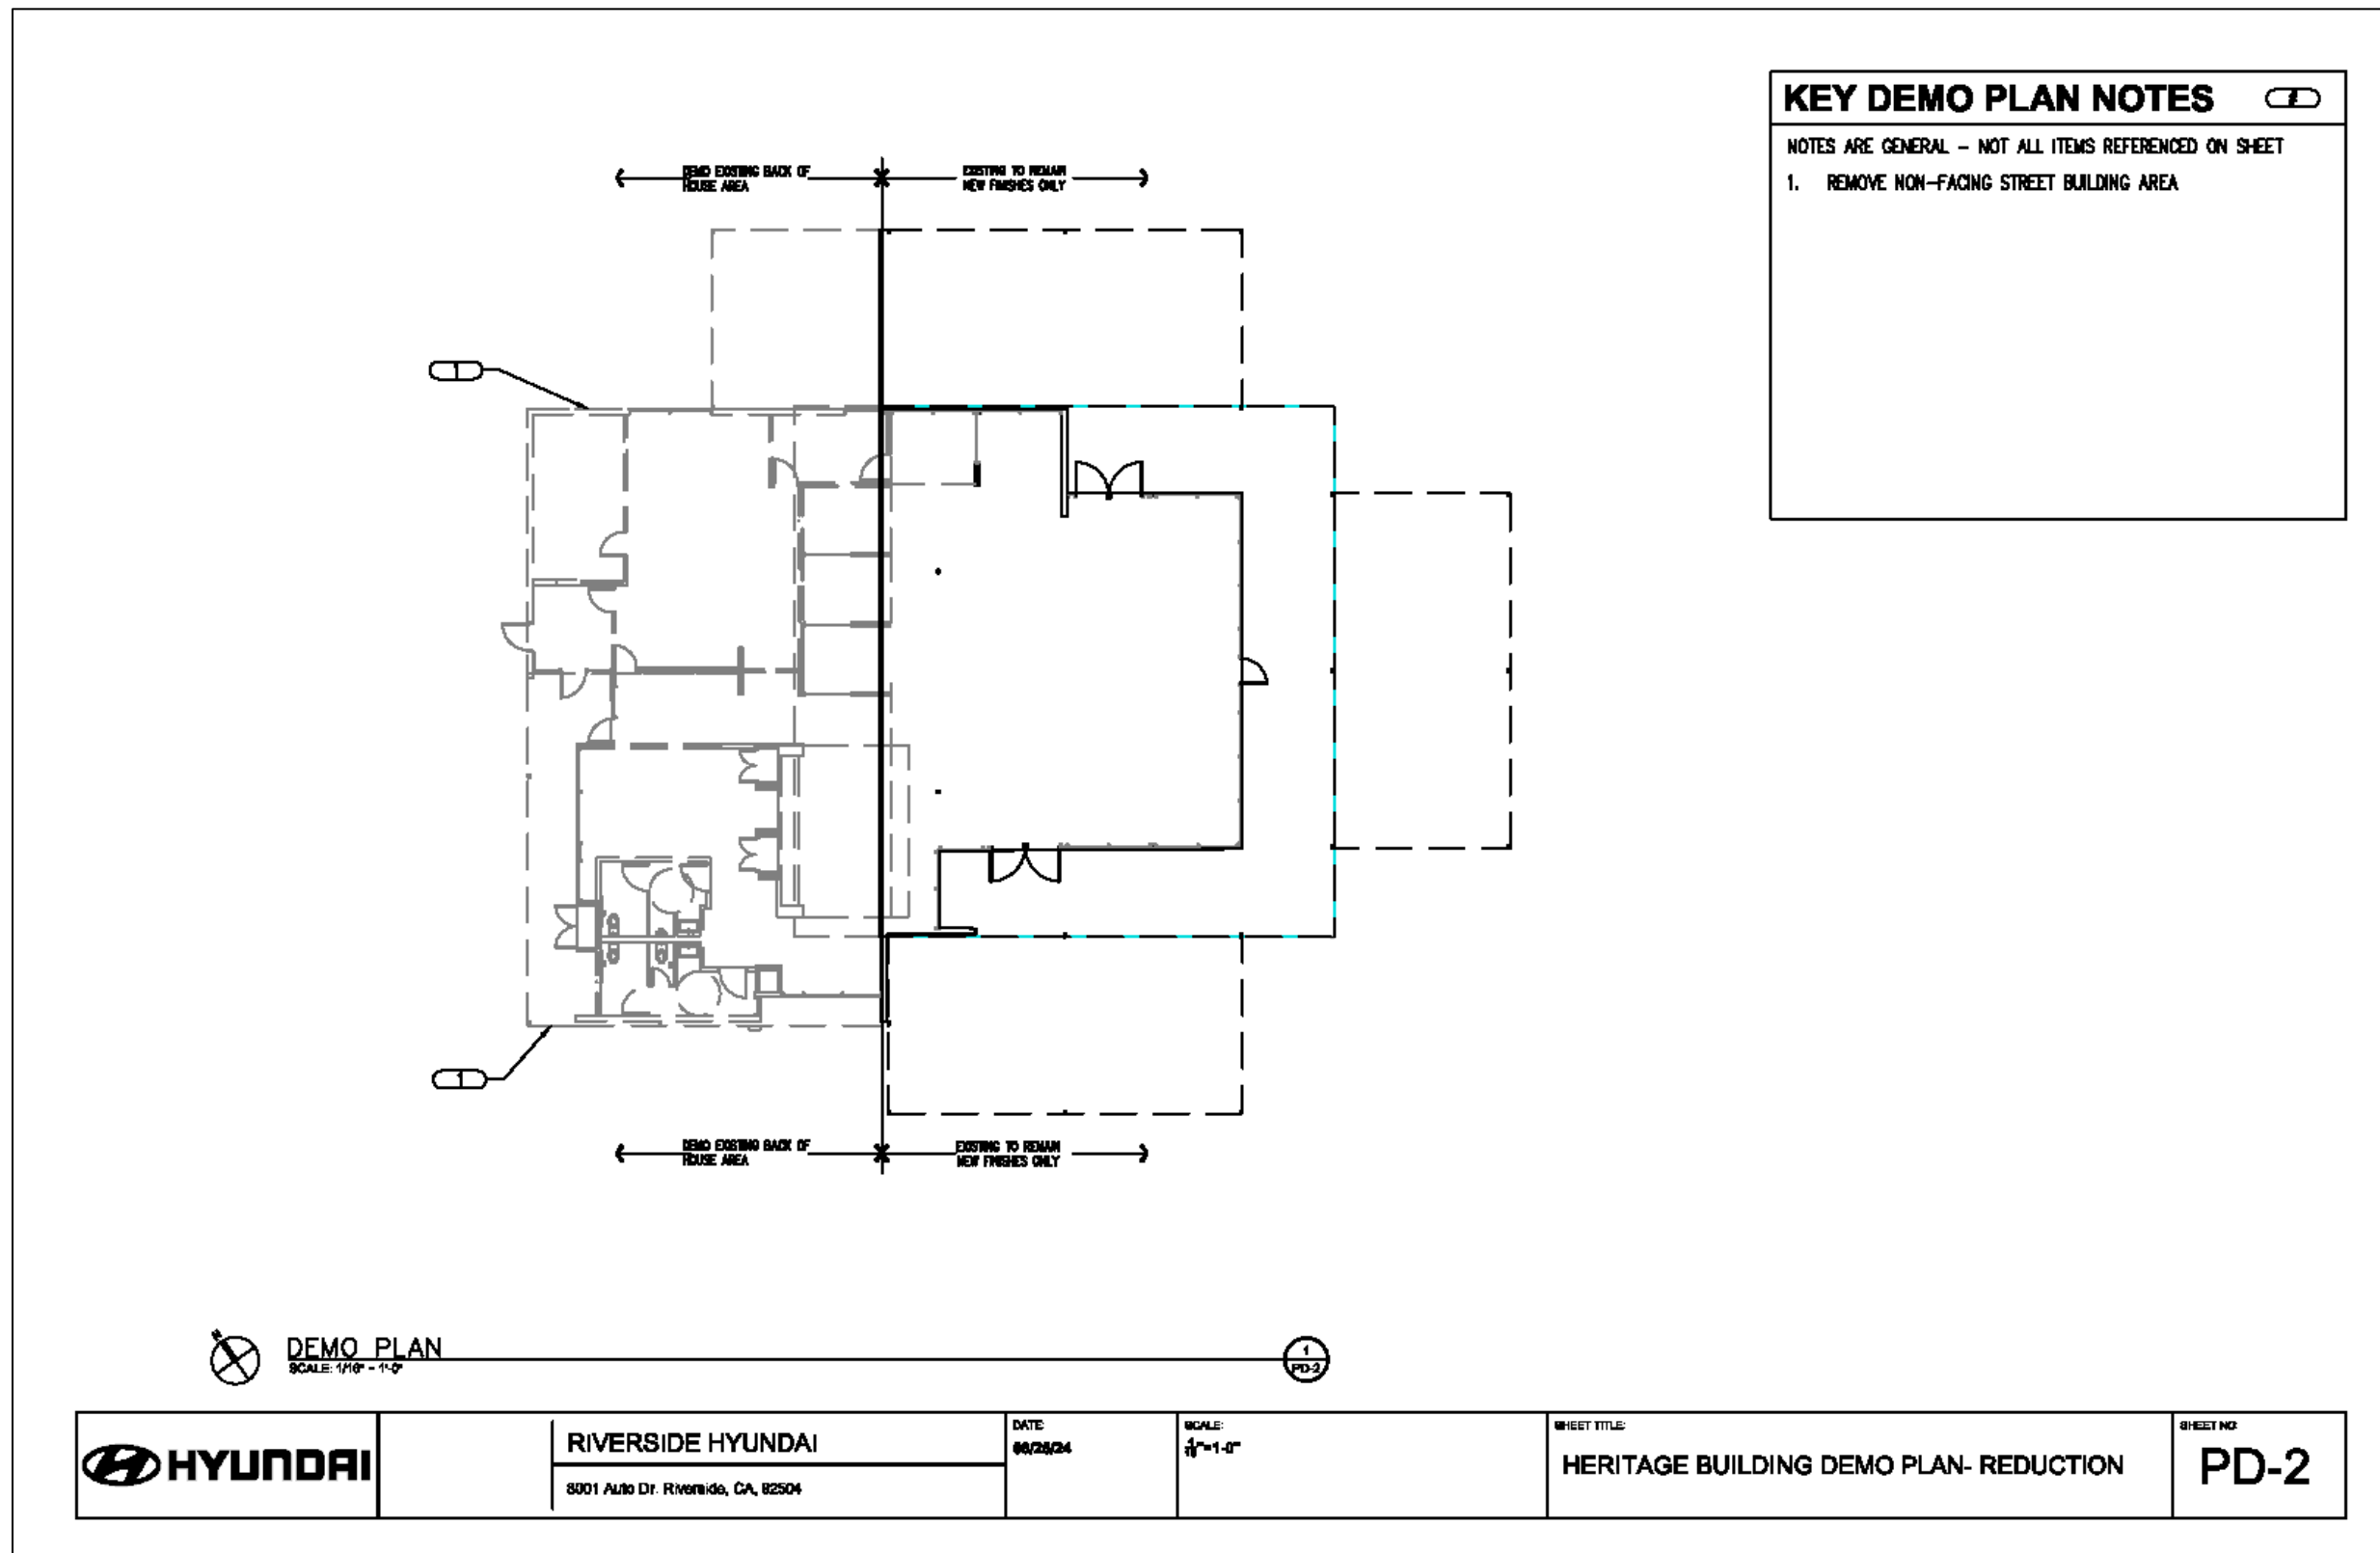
Floor plan view of the proposed Project (Provided by Mike Khoury).
